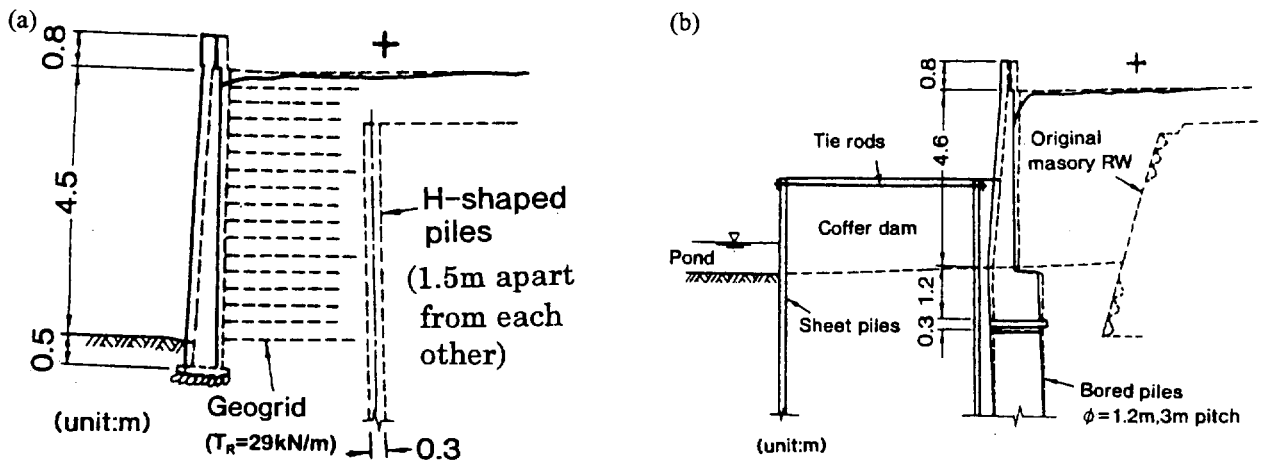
Cross-sections before and after the earthquake of slightly damaged RWs at Tanata; a) a GRS-RW having a FHR facing (n.b., effects of the H-piles on the wall stability are considered to be very small); and b) a RC RW supported with a row of bored piles.
